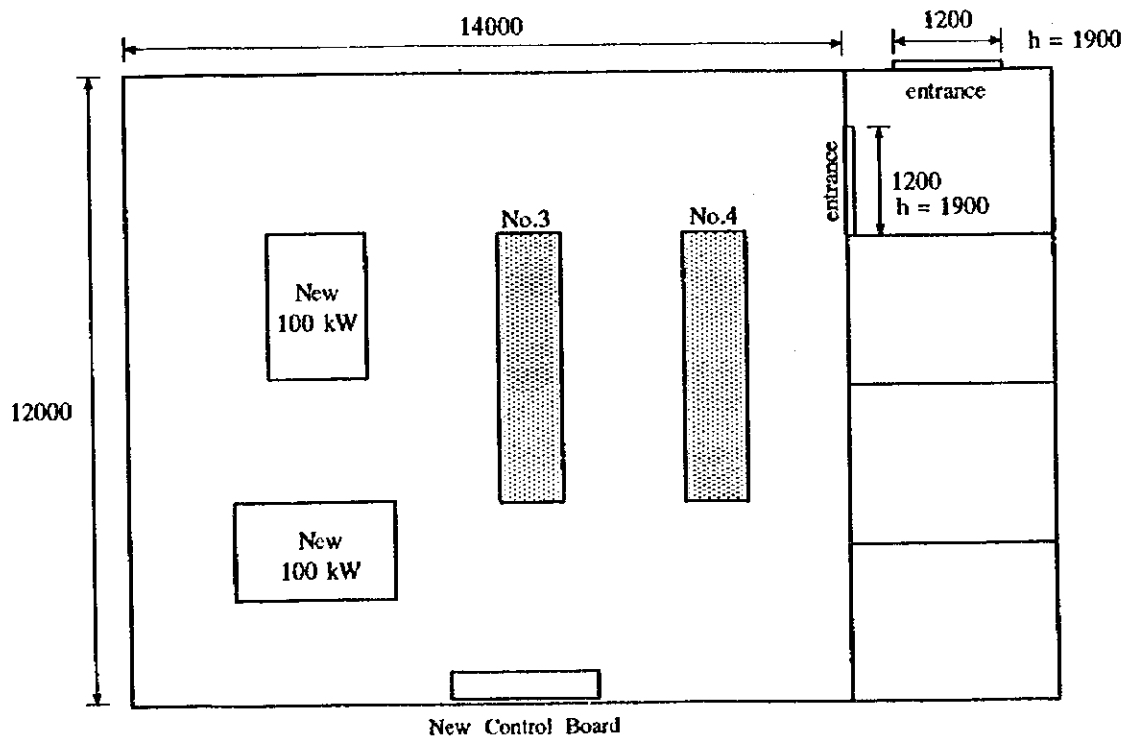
45 Layout Drawing of Erdenebulgan
